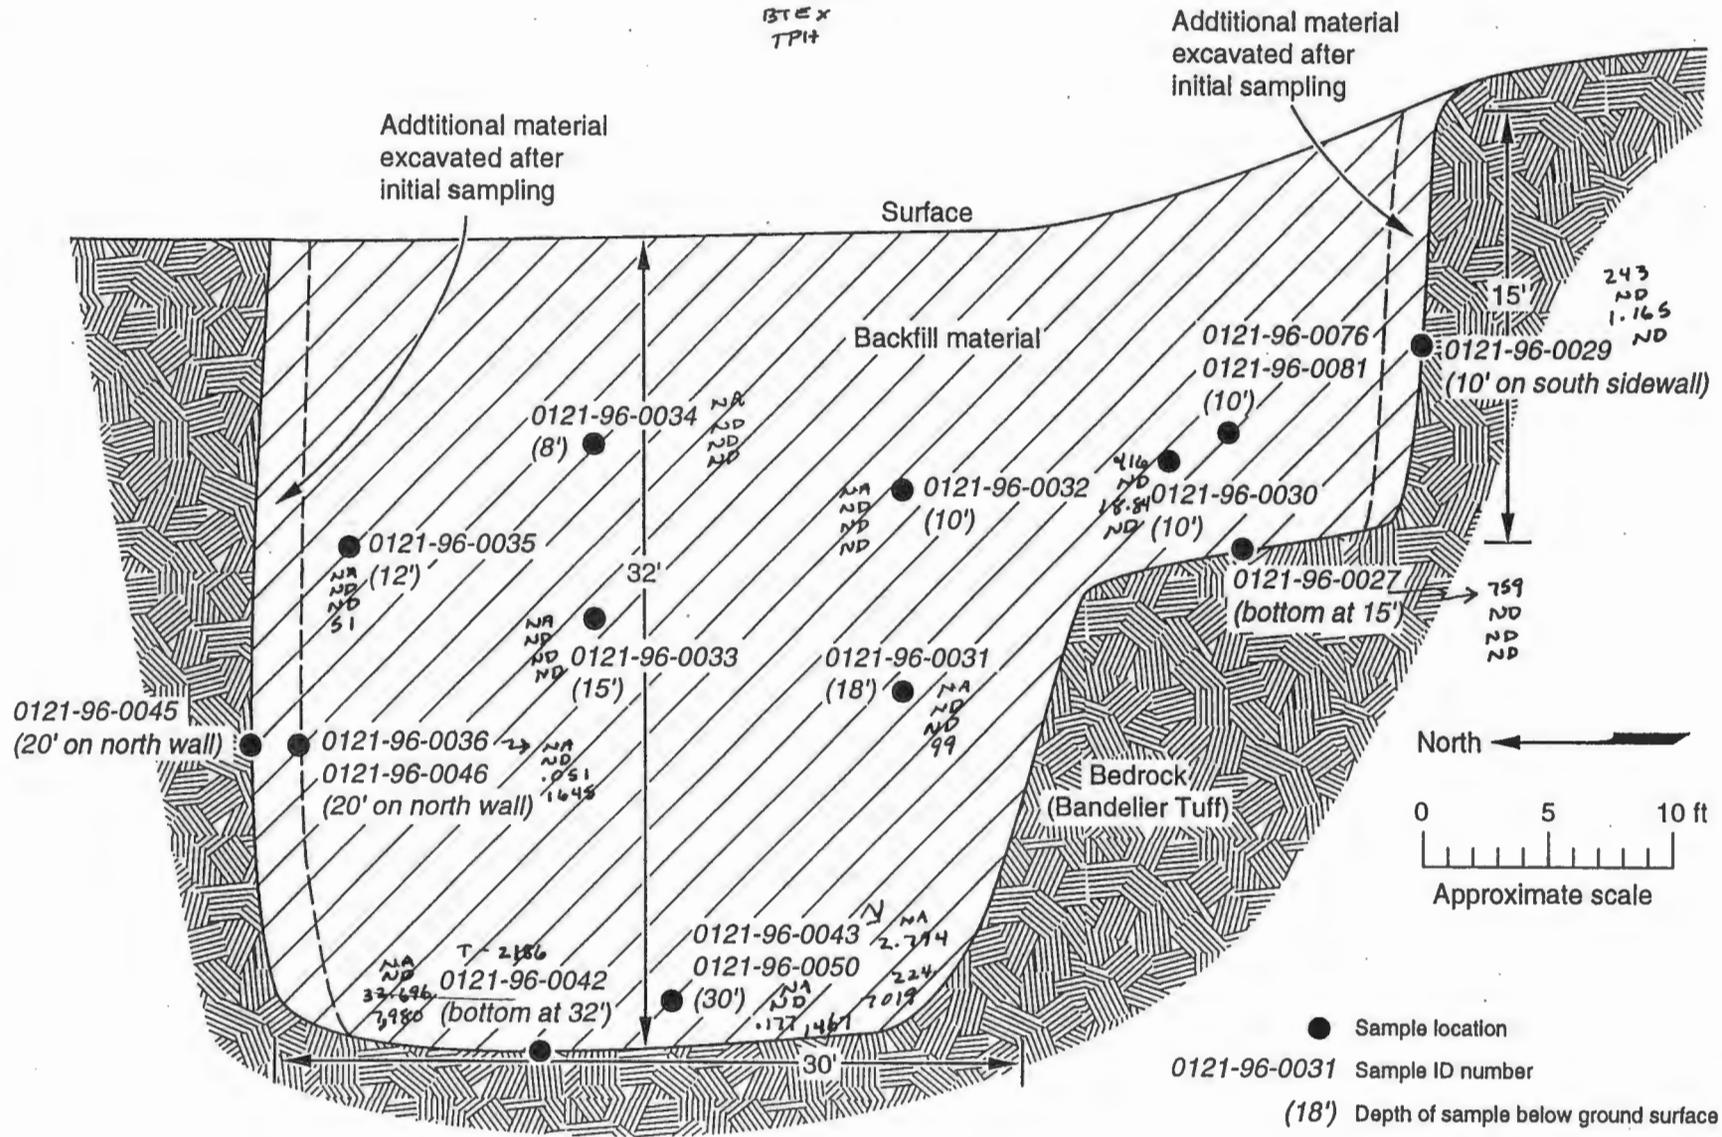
Approximate locations of confirmatory samples collected from east sidewall of excavation.
